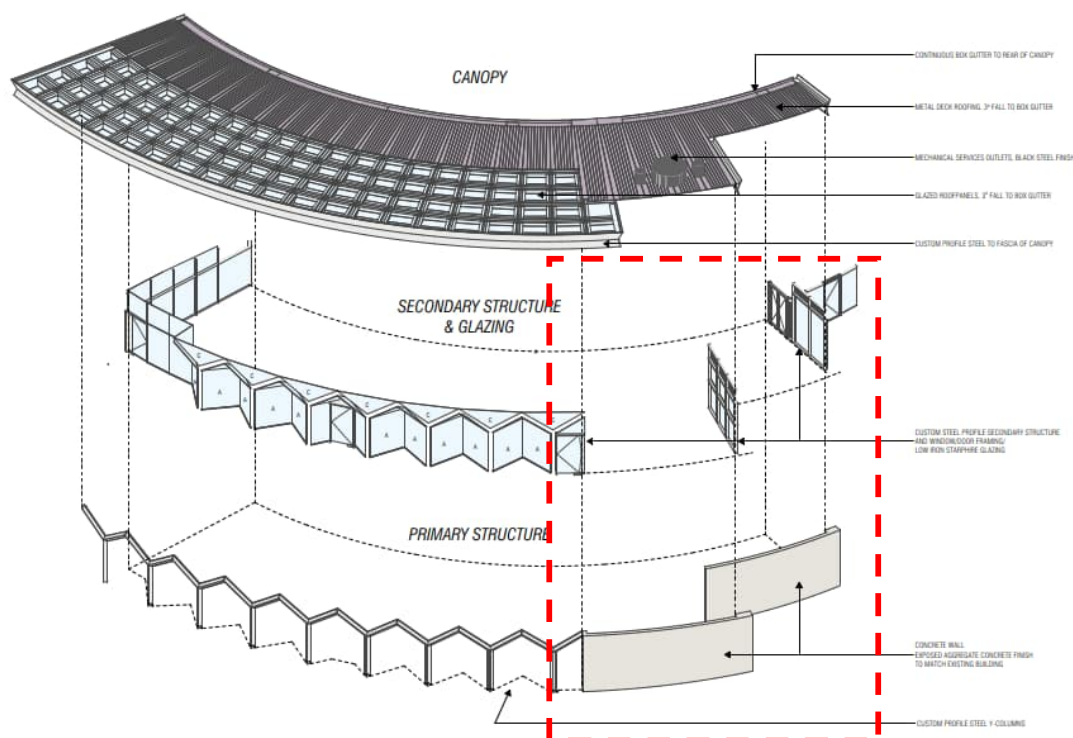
Extract of TP260, showing the proposed northern canopy structure in detail. Exposed aggregate curved walls highlighted in red. Source: FK, 2024.
